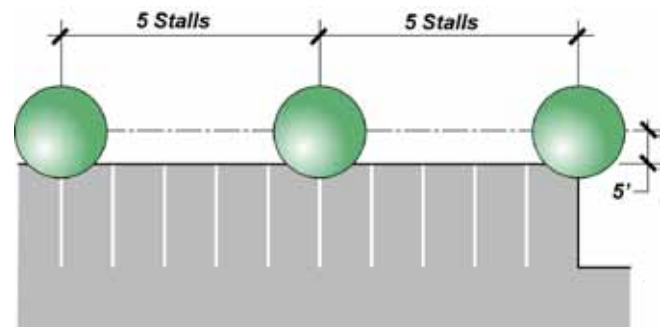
Provide trees at the perimeter of parking lots.
